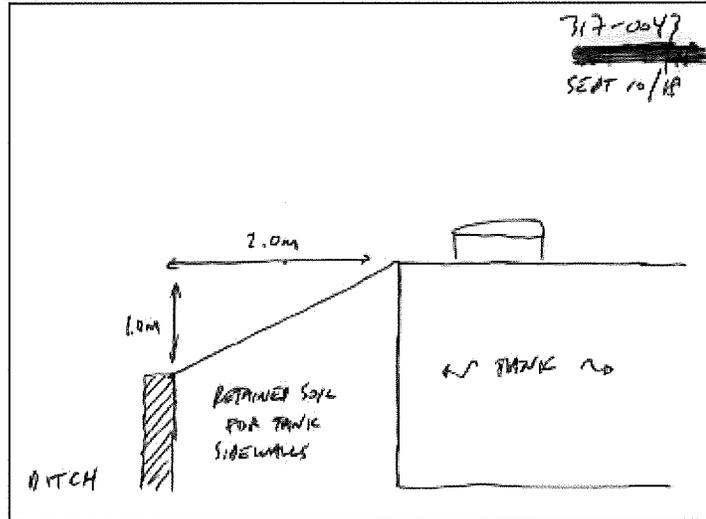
RETAINING WALL RELOCATION DESIGN DRAWING PROVIDED BY CLEARTECH.
